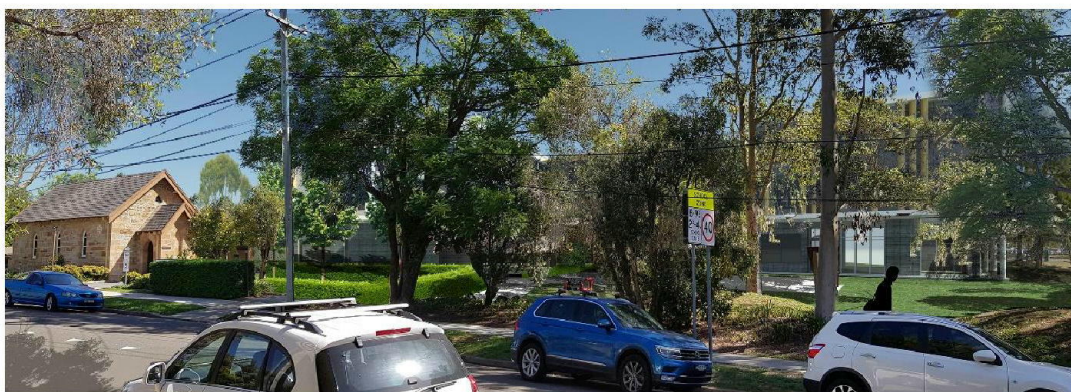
Artist perspective of view to the church from Emerald Street, new building to the right (Source MDP)
